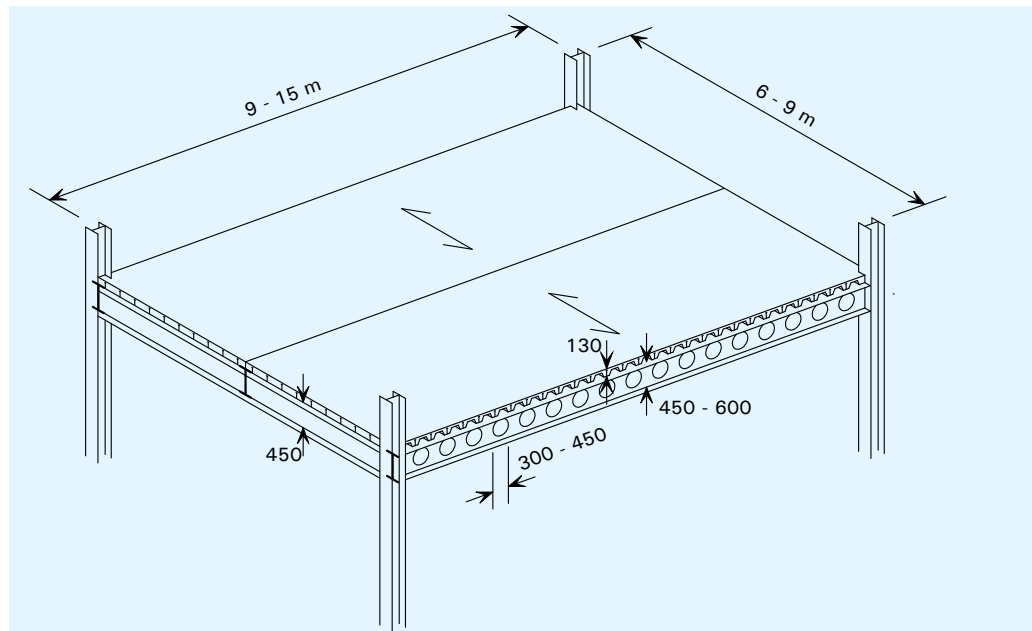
Typical long span secondary beams (span of slab is indicated)
